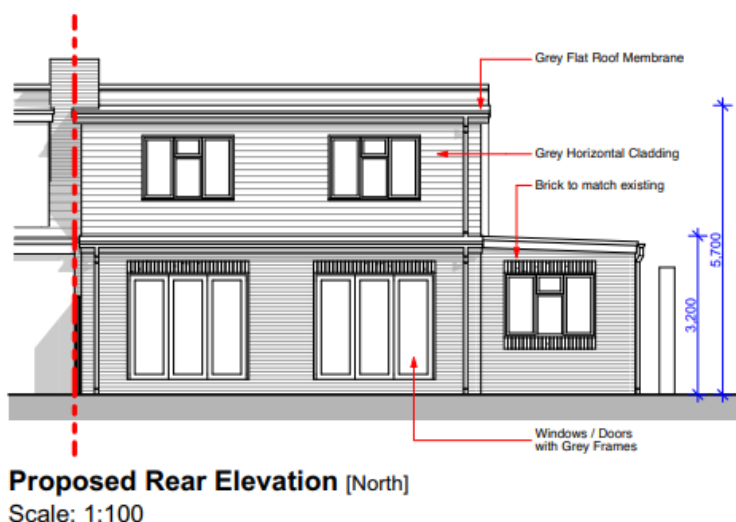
Approved rear elevation of 23/3448/HOT (Source DSA Architecture)
